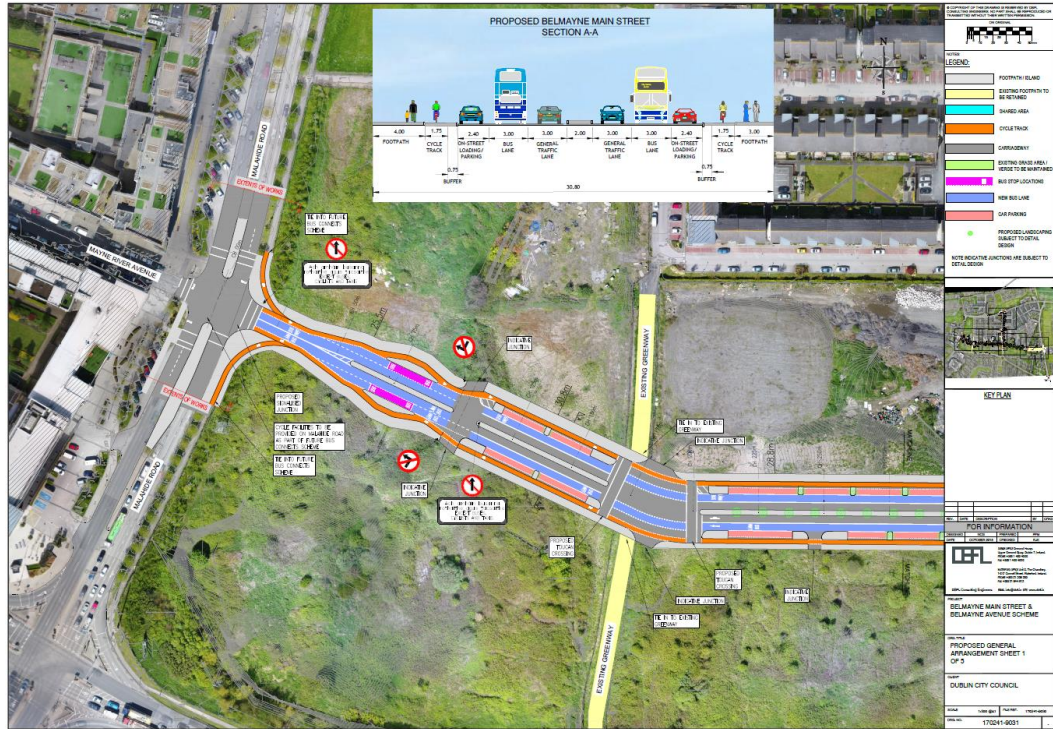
Proposed Design Layout & Cross Section for Belmayne Main Street
